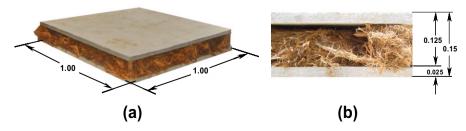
Ferrocement panels in sandwich configuration with coconut fibre filled: (a) isometric view and (b) details of transversal section.
